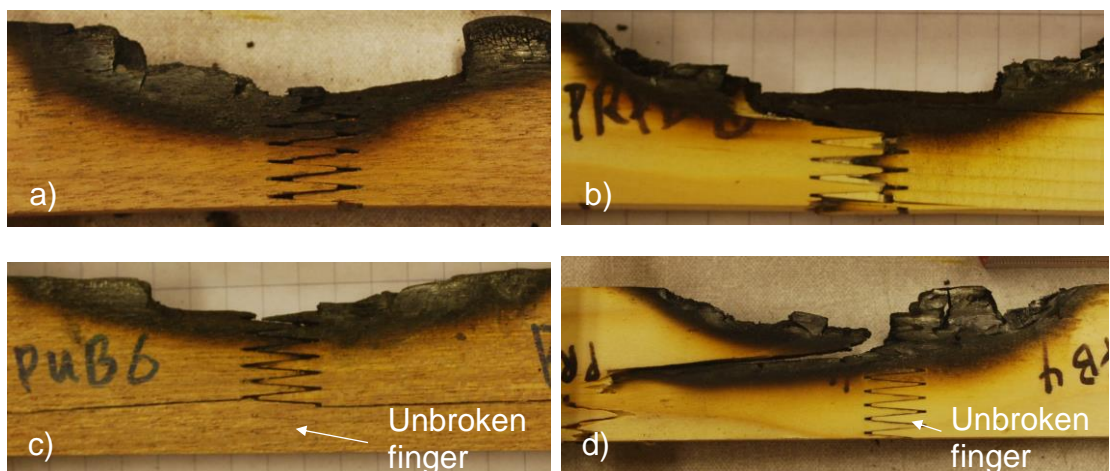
Typical failures of finger-jointed specimens a) failure along the glue lines; b) failure of the fingers; c) mixture of joint and wood failure; d) wood failure
